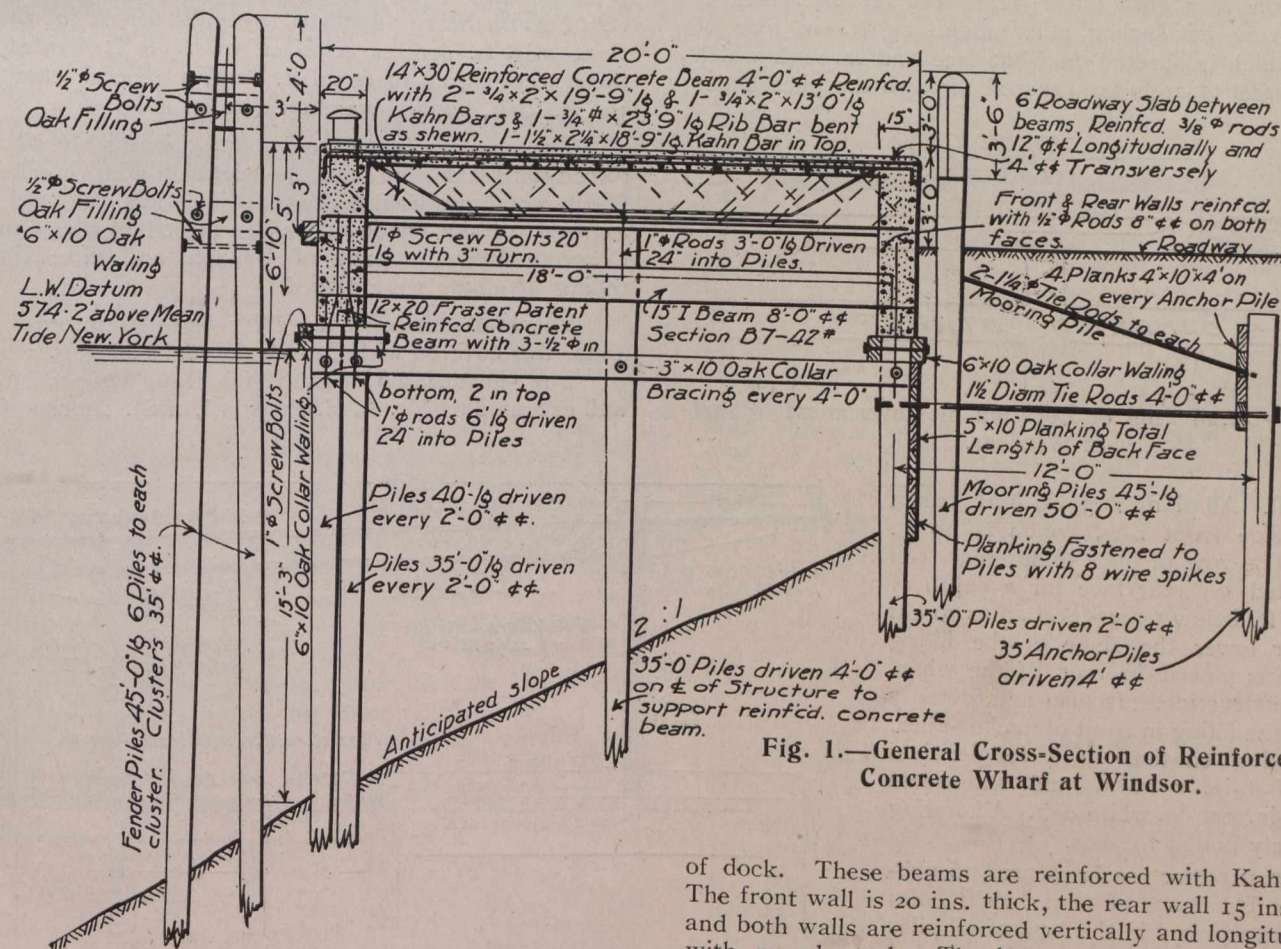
General Cross-Section of Reinforced Concrete Wharf at Windsor.
